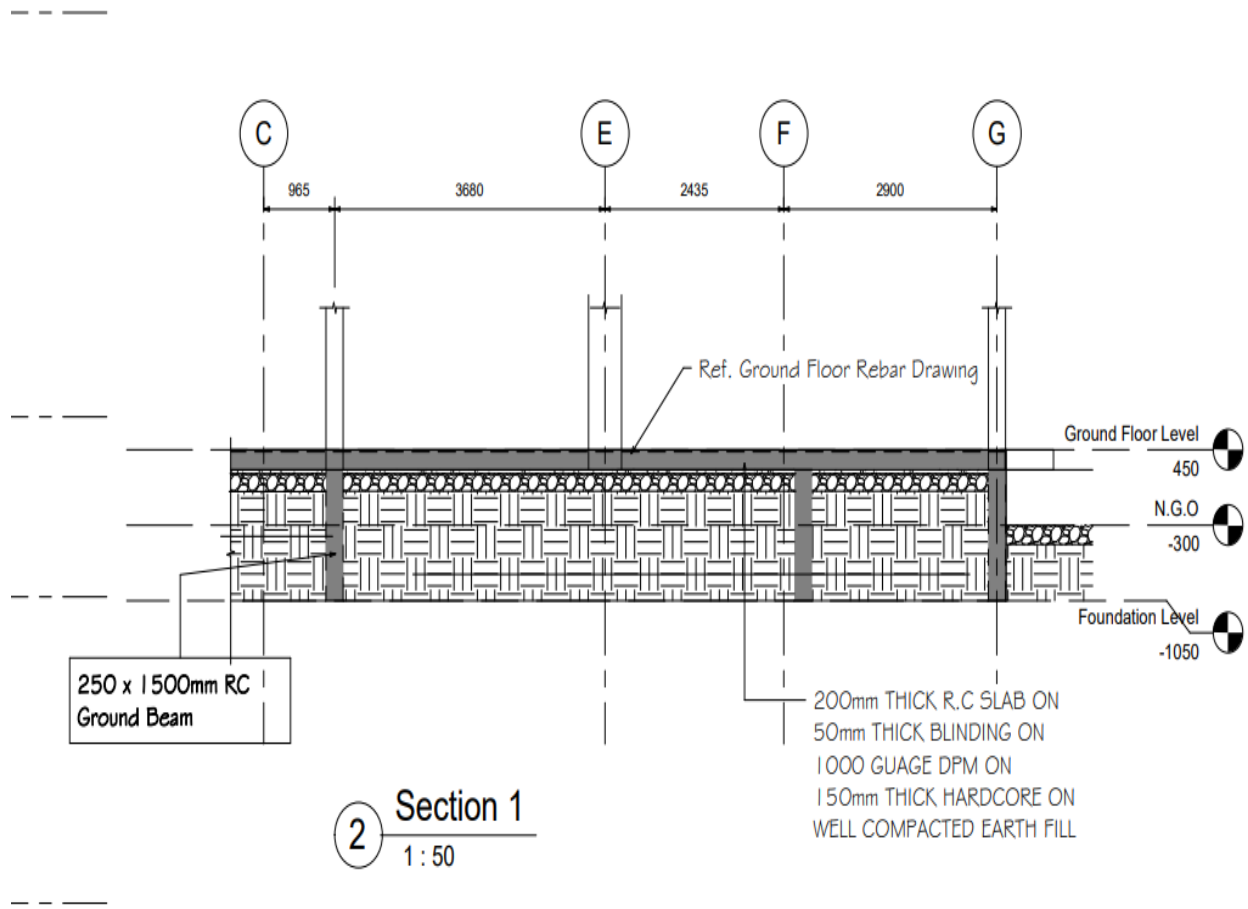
AN ENLARGED SECTION THROUGH THE GROUND FLOOR
